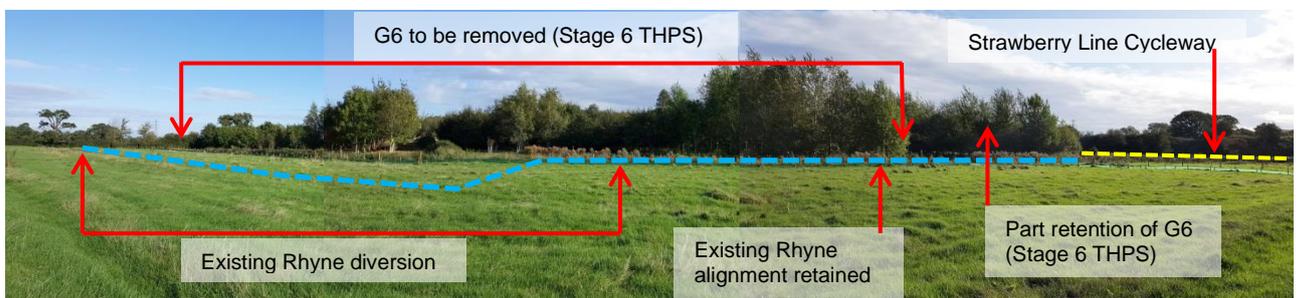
View looking east towards Strawberry Line from Planting Phase Area H
